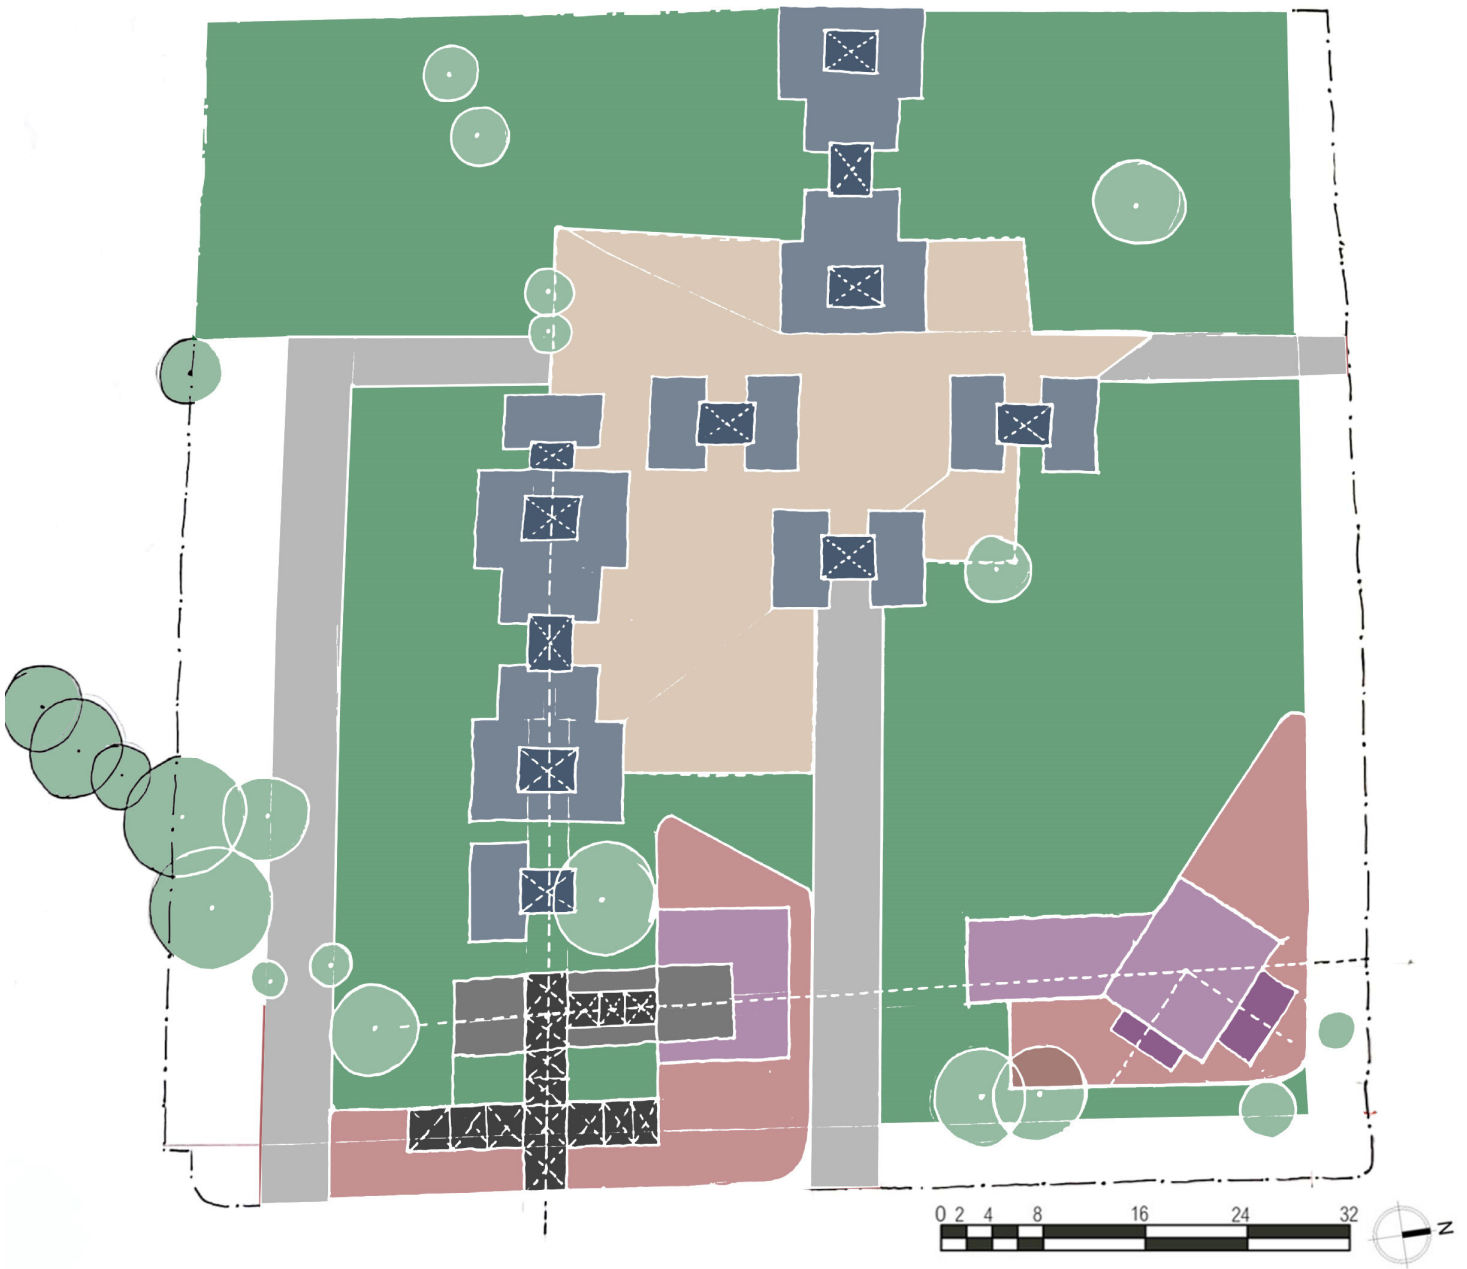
Colour block plan of the entire site and first attempt at organizing the diverse spaces on site. (Authors Own)
